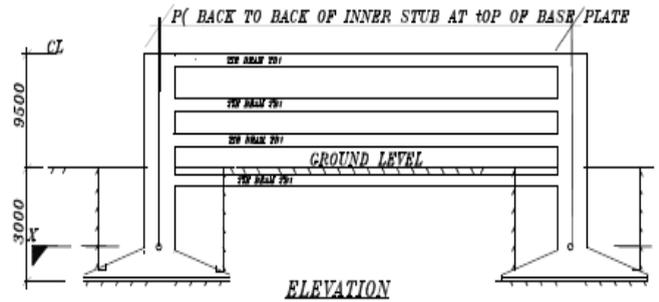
Typical Elevation of foundation showing tie beam arrangements
